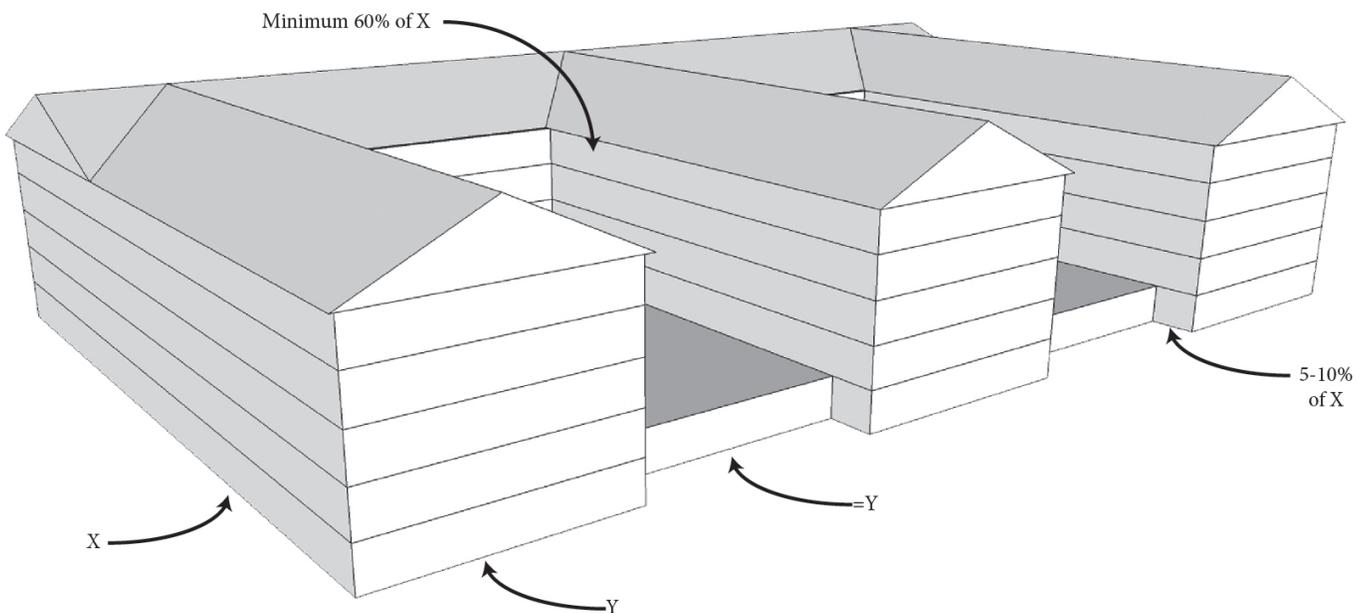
Axon of Design Guidelines for Exceeding Maximum Floor Plate
